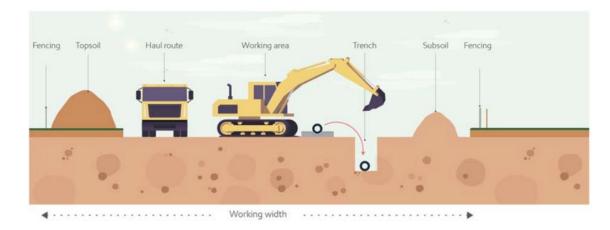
Open Cut Trenching Installation Technique (not to scale)
